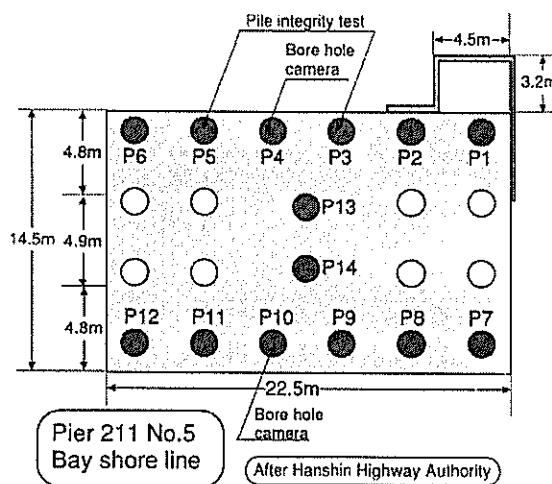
Plan View of the Foundation of Pier 211 (Hanshin Highway Authority, 1996).
